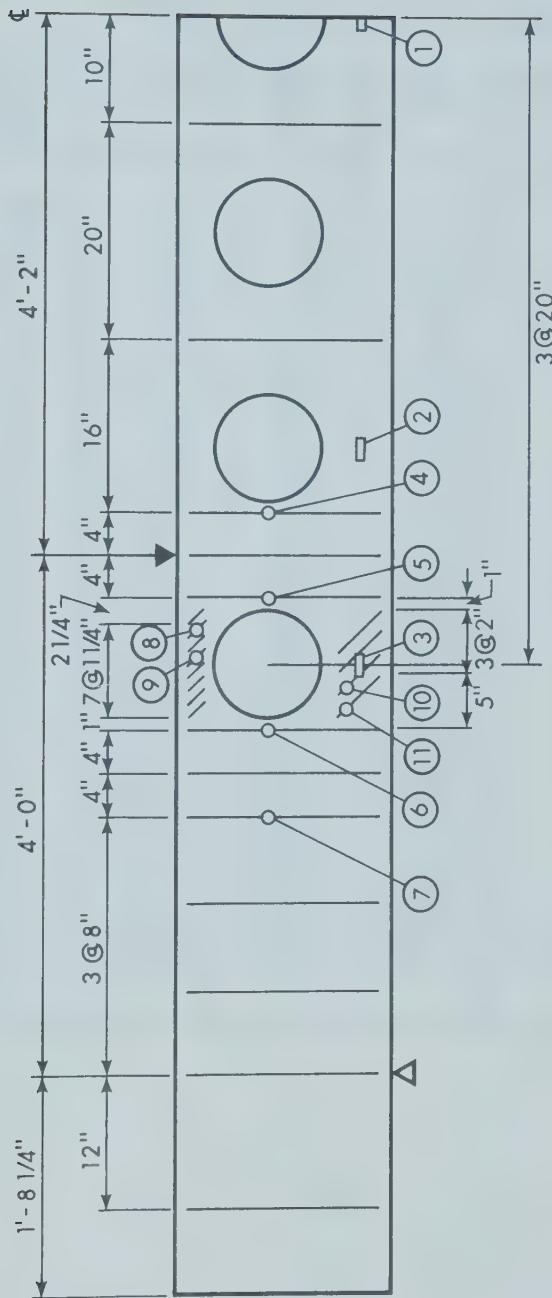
BEAM AD-5 REINFORCEMENT AND GAUGE DETAILS
